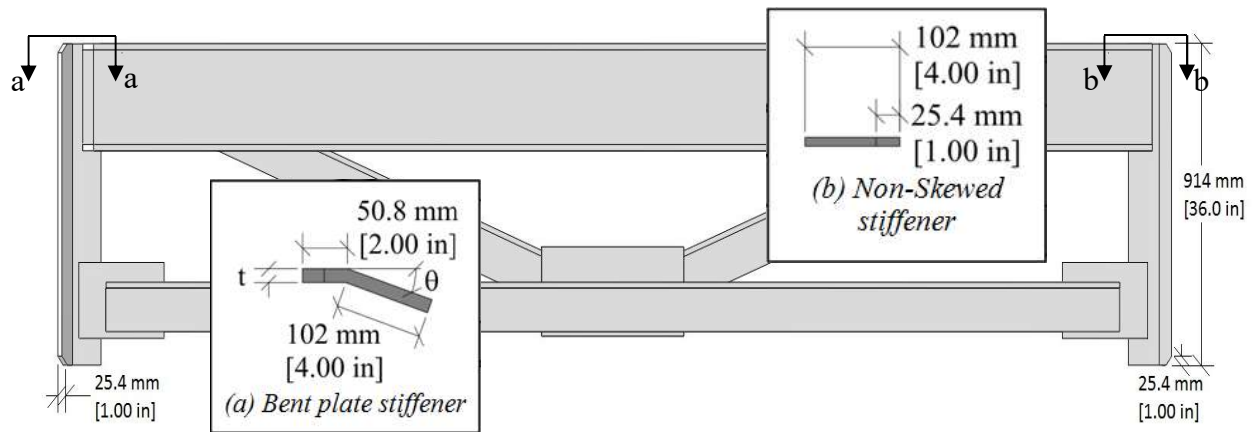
Abutment diaphragm and connection stiffener geometry
